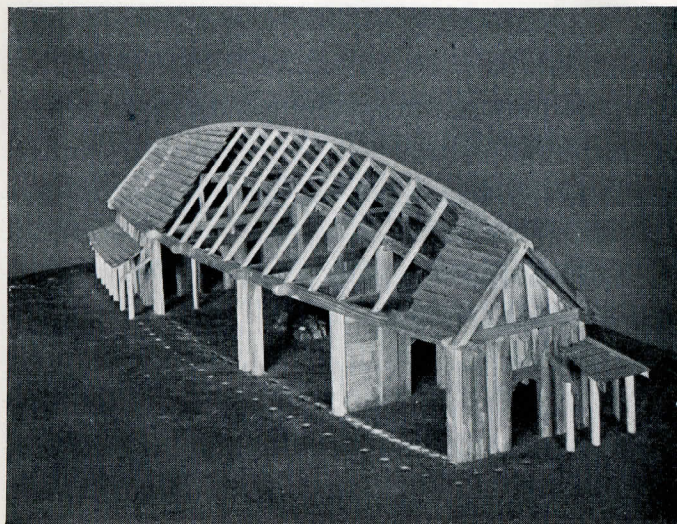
Tentative model of a Trelleborg house and holes for wall-planks and gallery-posts. The peculiar ground-plan of the house requires a strongly arched roof-ridge. The rafters are supported by purlins resting on the strong posts of the side-walls.
